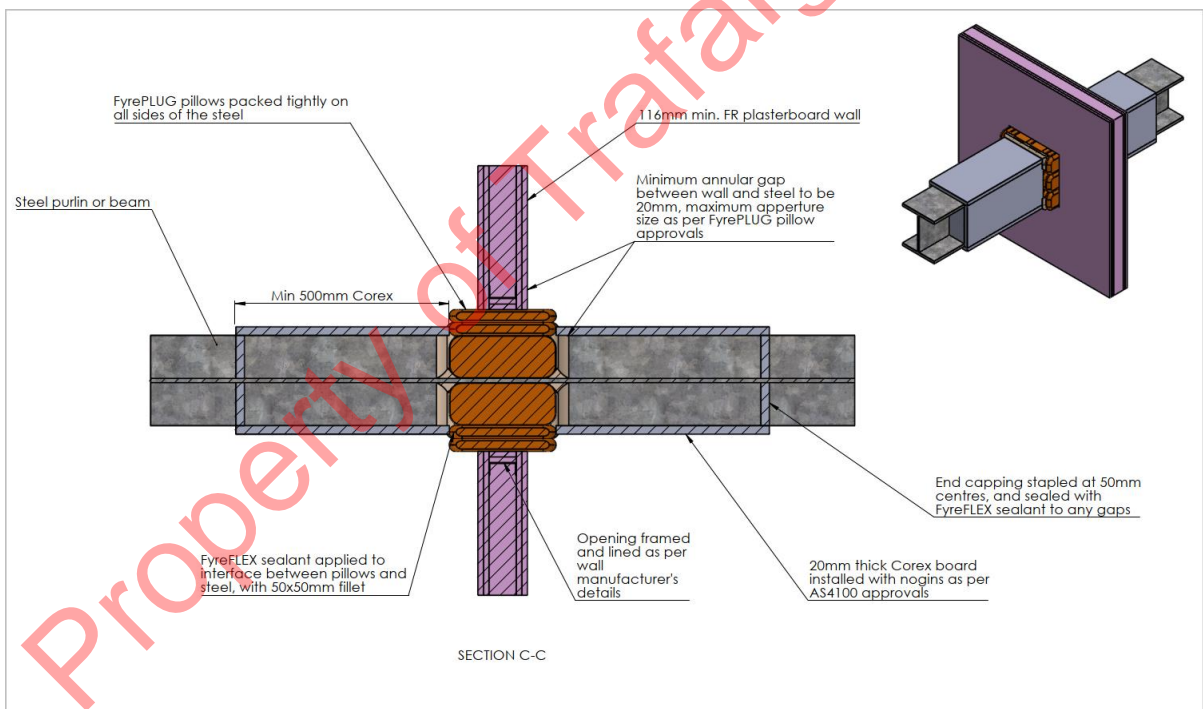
Proposed steel beam/purlin penetration system – detail 3
